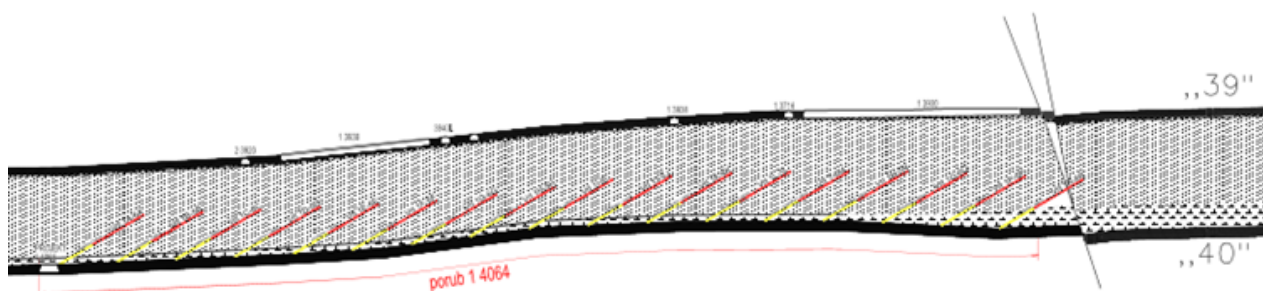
N-S section of the boreholes for NPLSB in the Longwall Face No. 4064. Legend: vrt – borehole
